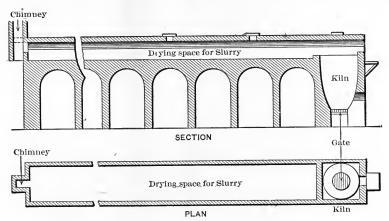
Plan and section of Johnson kiln. (Engineering News.)
